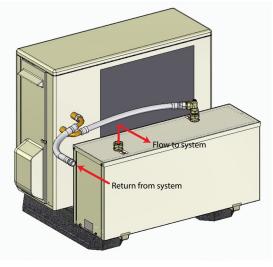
External volumiser connection to HPID6R32 heat pump
